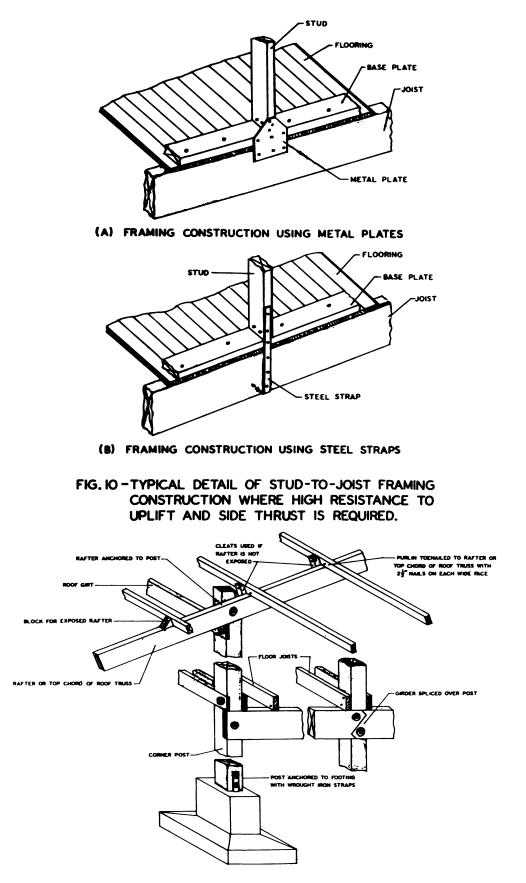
FIG. II - TYPICAL DETAILS OF WOOD FRAMING CONSTRUCTION
